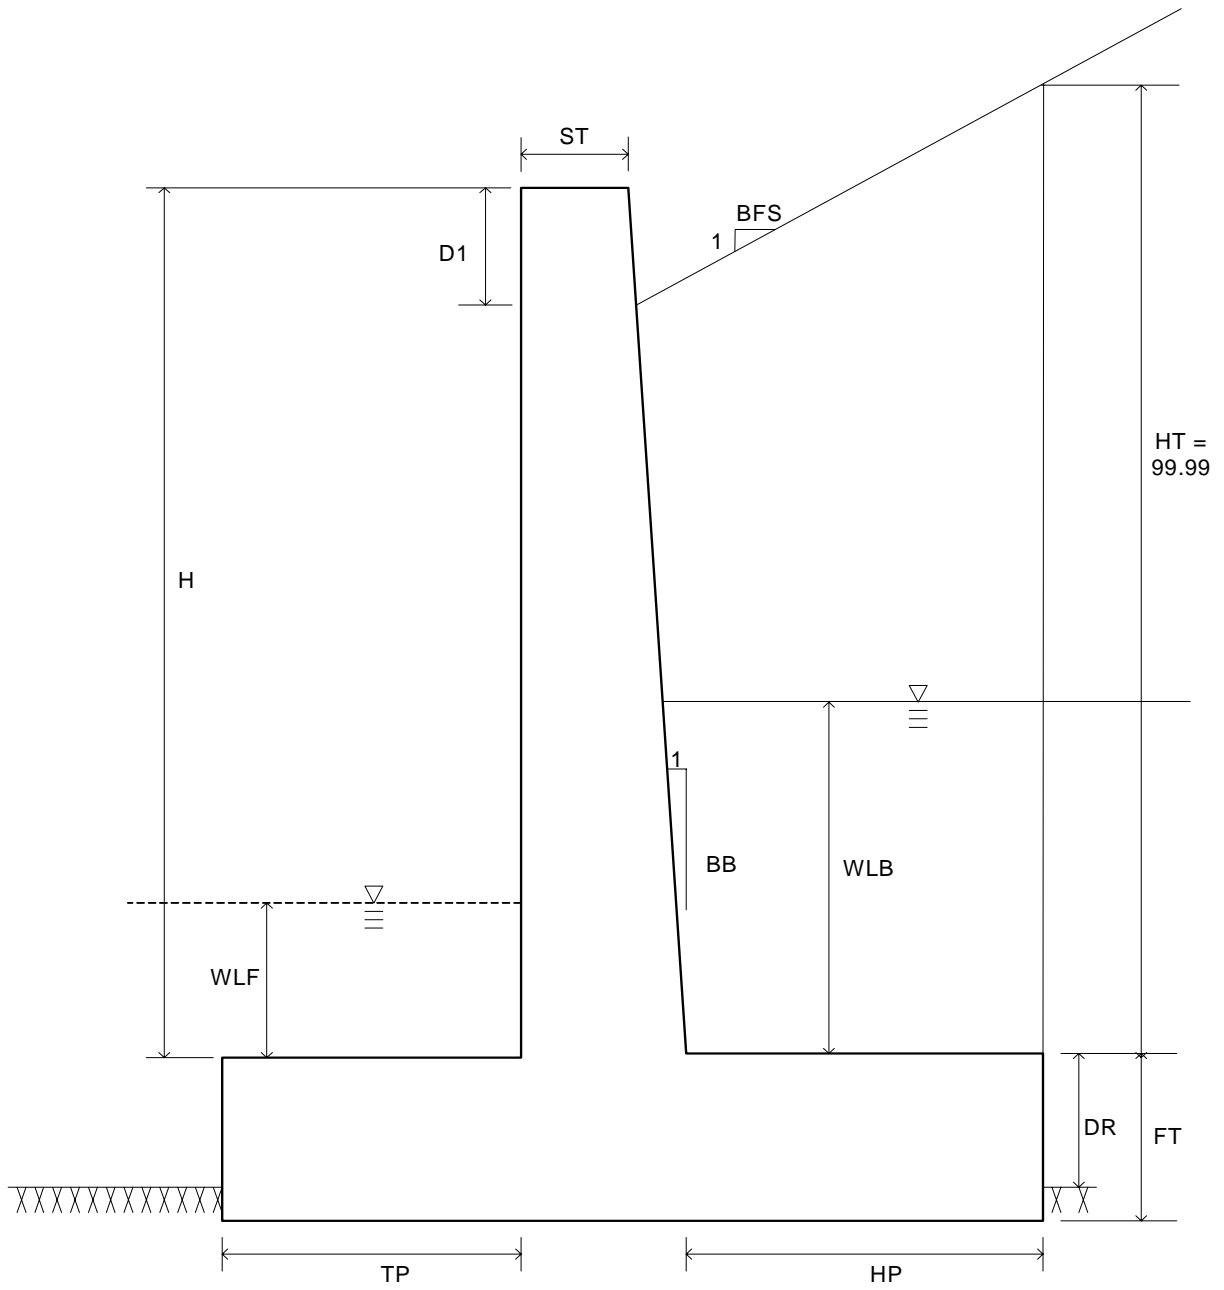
Input Dimensions - Retaining Wall with Continuously Sloping Backfill
